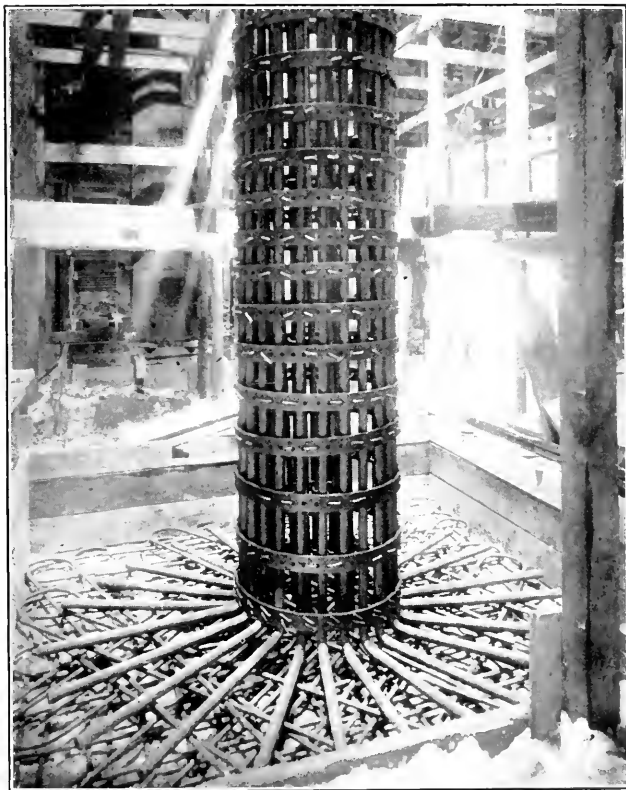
Cut showing reinforcement of column carrying working pressure of 4000 pounds per inch on the core.
